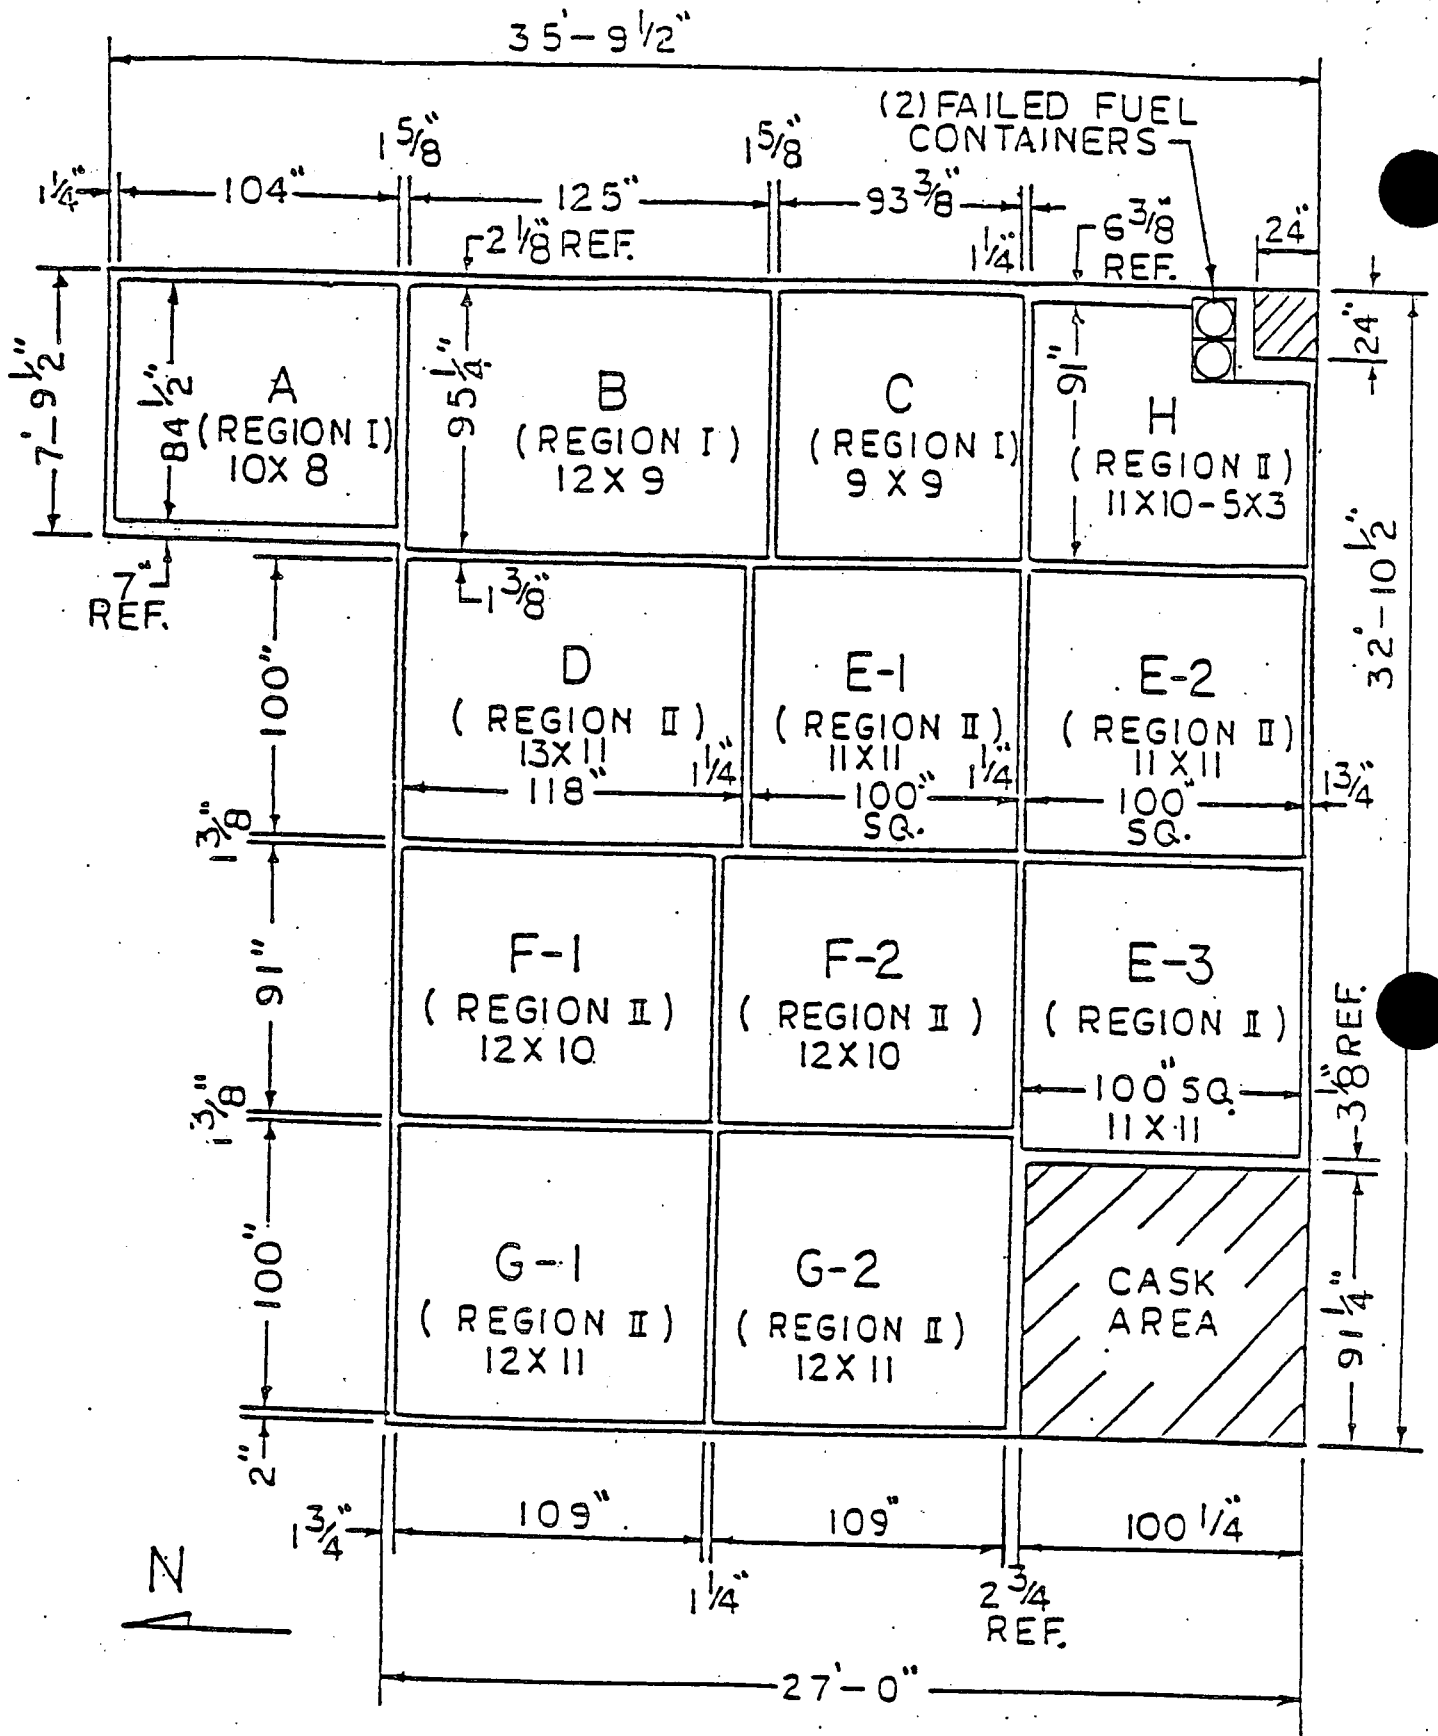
MODULE LAYOUT - IP2 POOL
